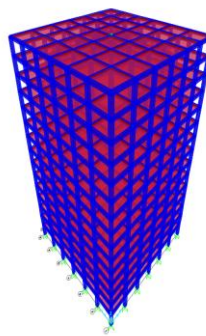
3D view and elevation of model-2 15-storey normal building with TMD
